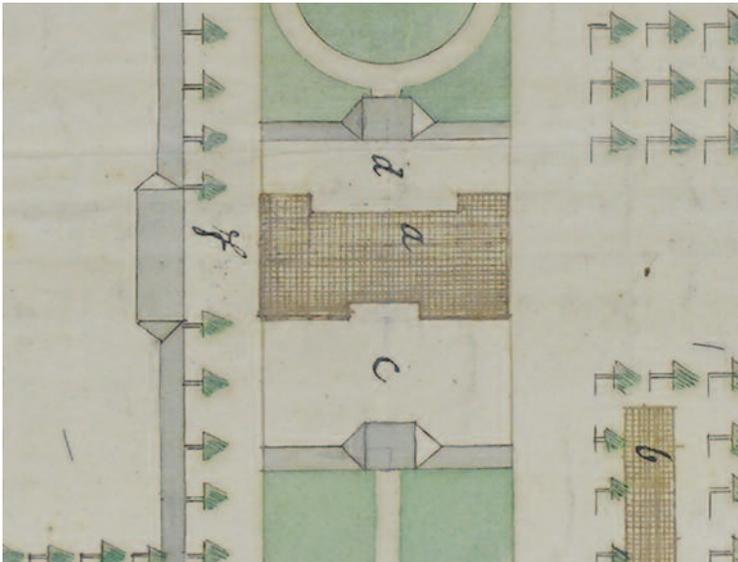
Detail of a plan for a proposed new garden layout at Newby Hall, showing the original outline plan of Sir Edward Blackett's house, c.1730. *WYAS.
